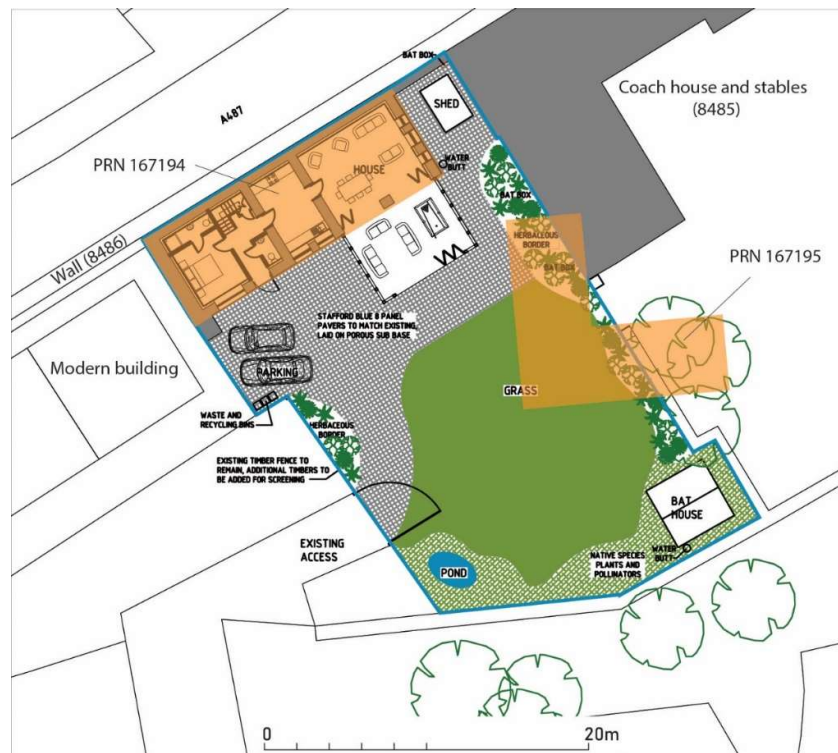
The proposed layout of the development showing the extent of the surviving building and the approximate location of the building shown on the tithe survey
